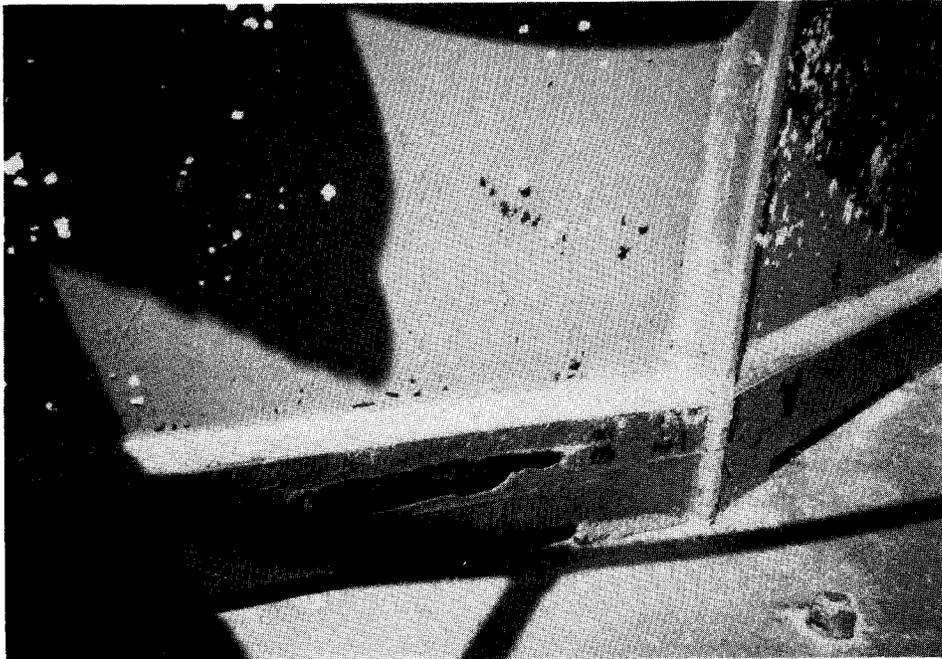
Tower, corroded metal vent cover at base of Lantern.
